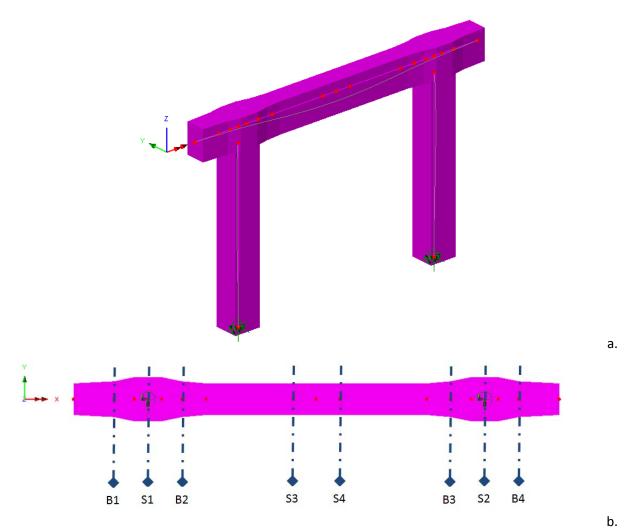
Overview of Pier E2 Frame model; a. 3D view. b. Identification of Strut Cross Sections
